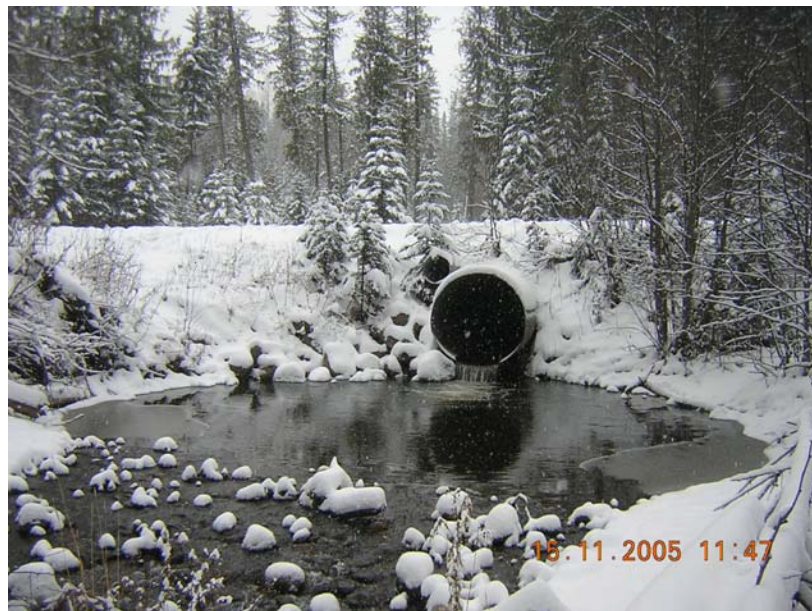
View looking upstream at stream channel and culvert outlet. Existing rock riffle in foreground controls the elevation of the pool.
